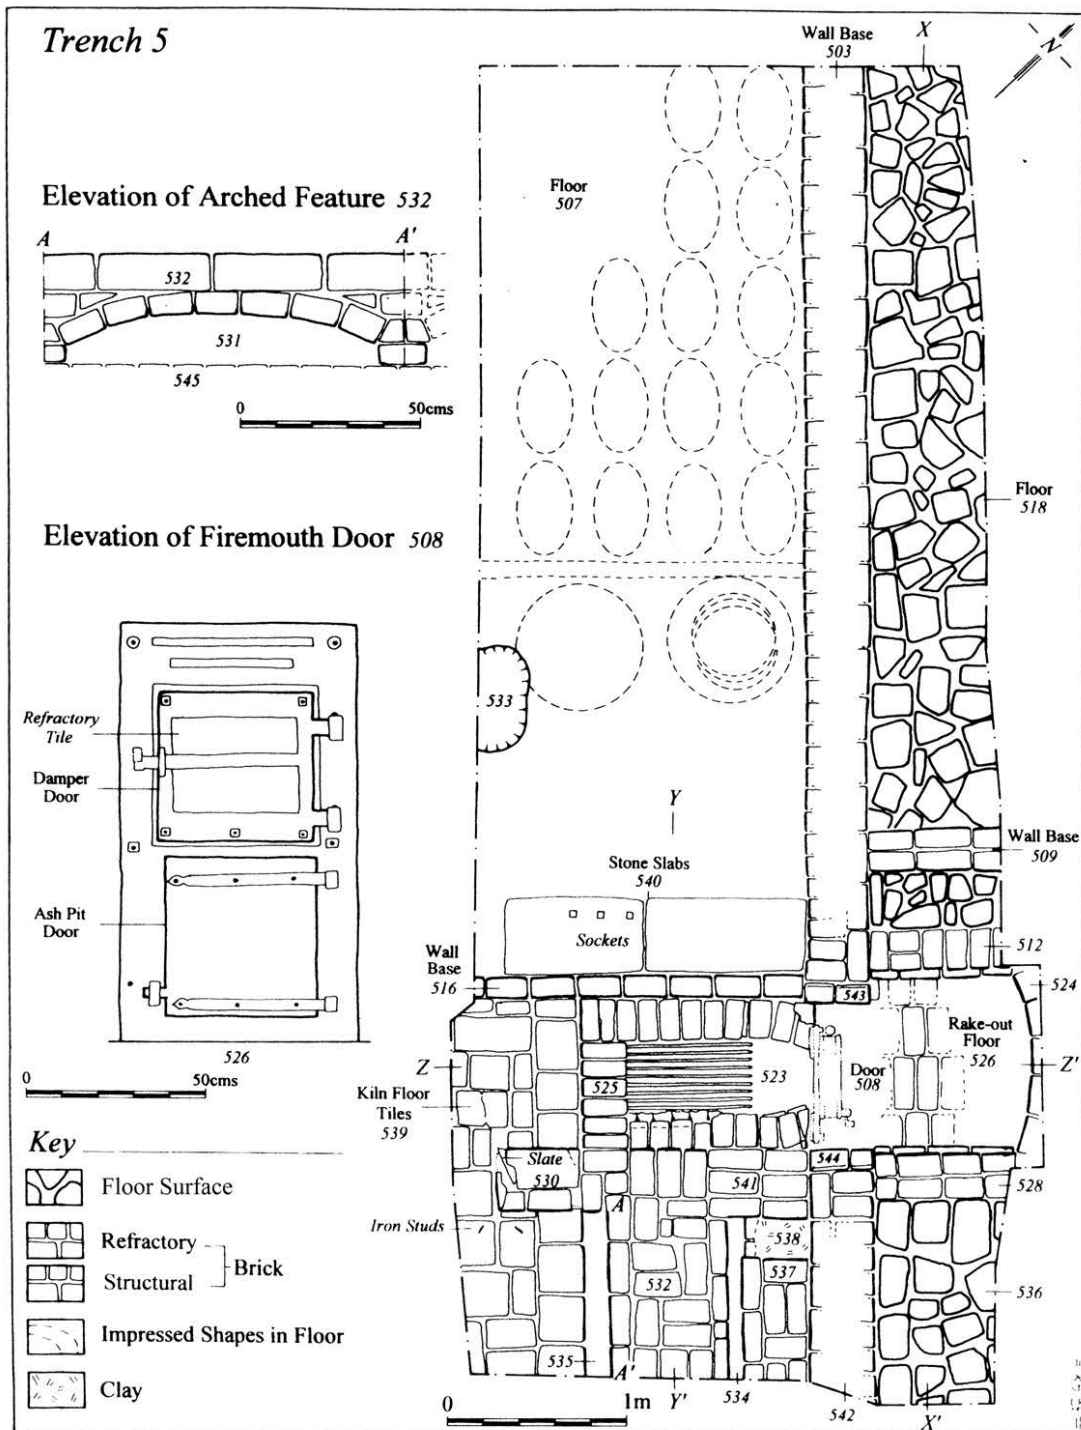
Trench 5 plan with (508) firemouth door and (531) arch elevation.
